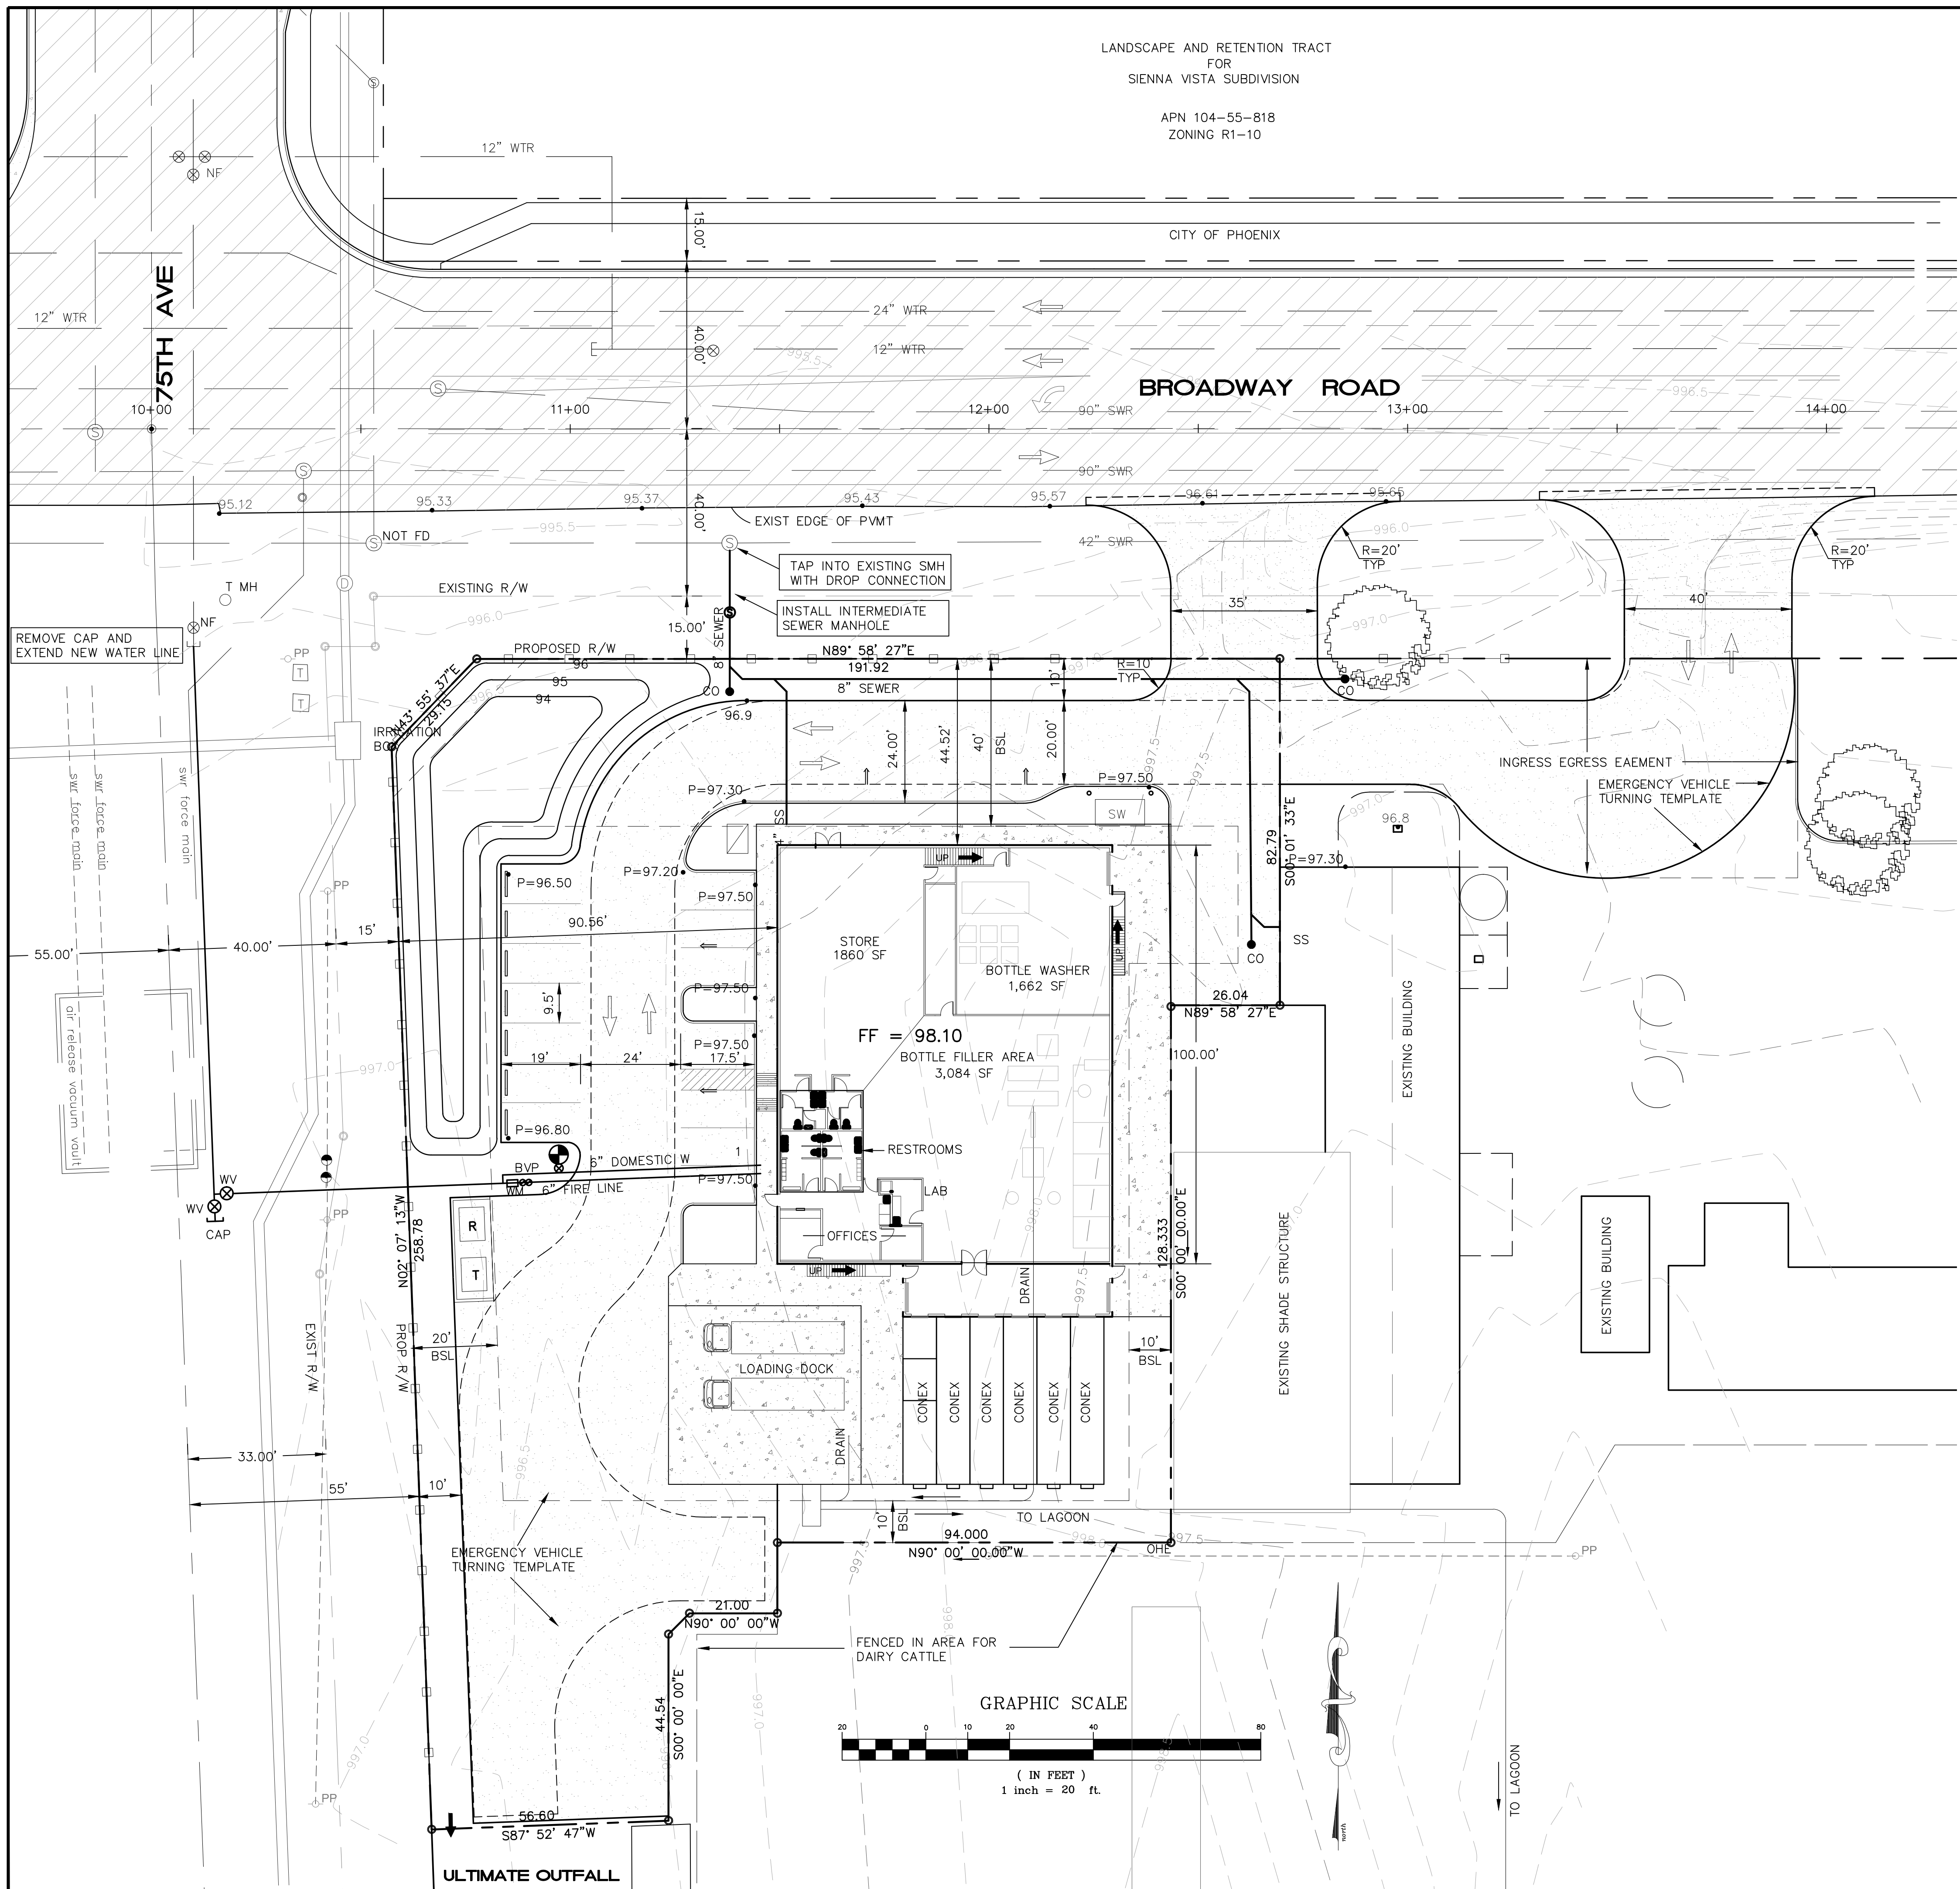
CONCEPTUAL DANZSEISEN (DAIRY FARM) SITE PLAN
